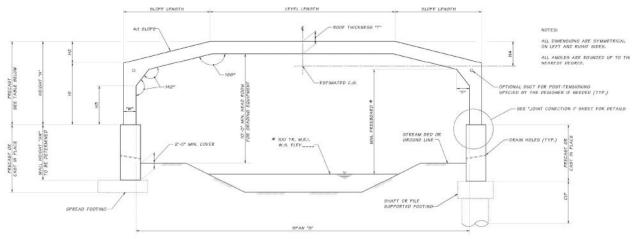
Details of the Washington State Department of Transportation standard precast concrete three-sided structure. The precast concrete unit is supported by either cast-in-place or precast concrete foundation units.
